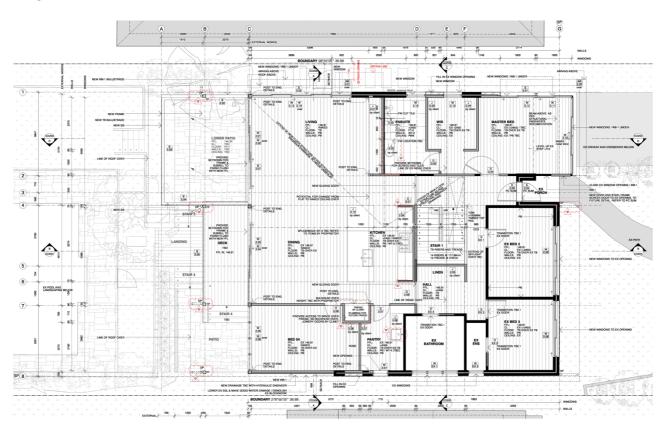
CDC Ground Floor Plan 11 Jones Street, Beacon Hill
